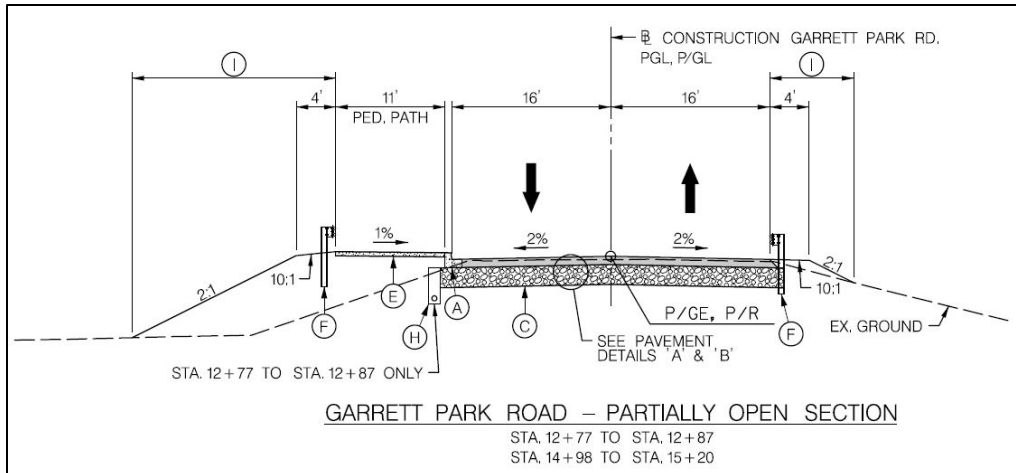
Proposed Typical Cross Section – Bridge Approaches
